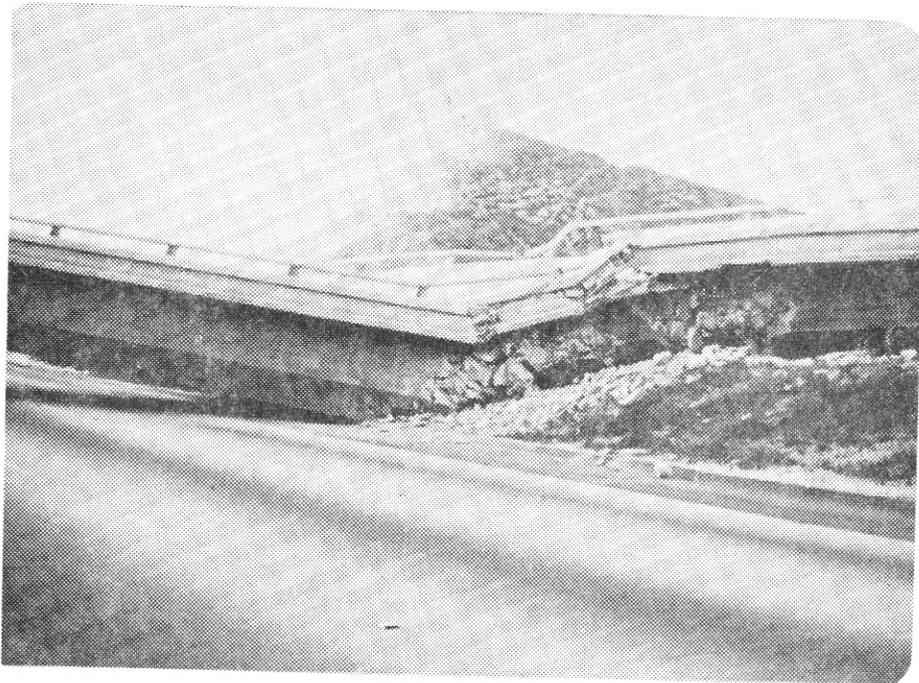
The center portion of the collapsed Route 5 southbound truck freeway bridge.
